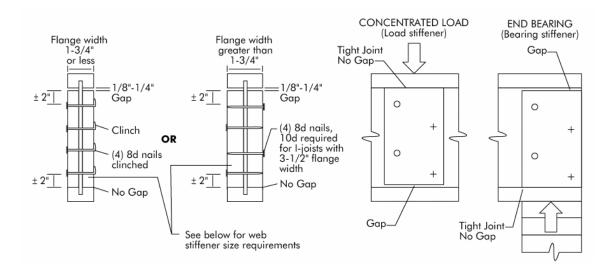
PRI I-JOIST WEB STIFFENER CONSTRUCTION DETAILS
